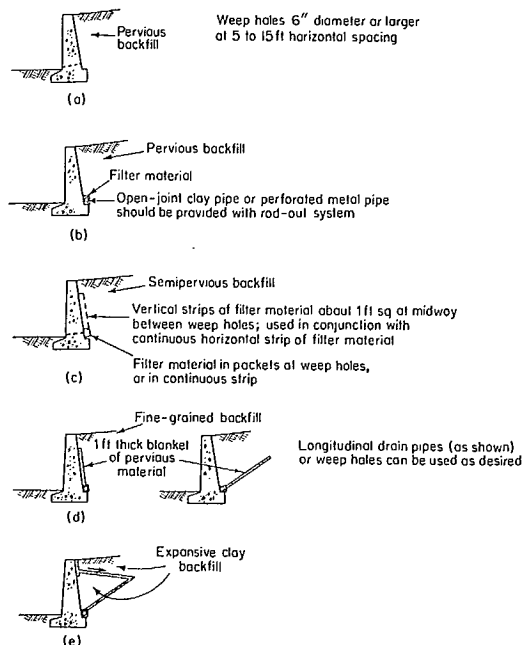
Common types of retaining wall drainage: a) weep holes; b) longitudinal drain pipe; c) weep holes with filter strips; d) blanket drain; e) double blanket drain (33).
